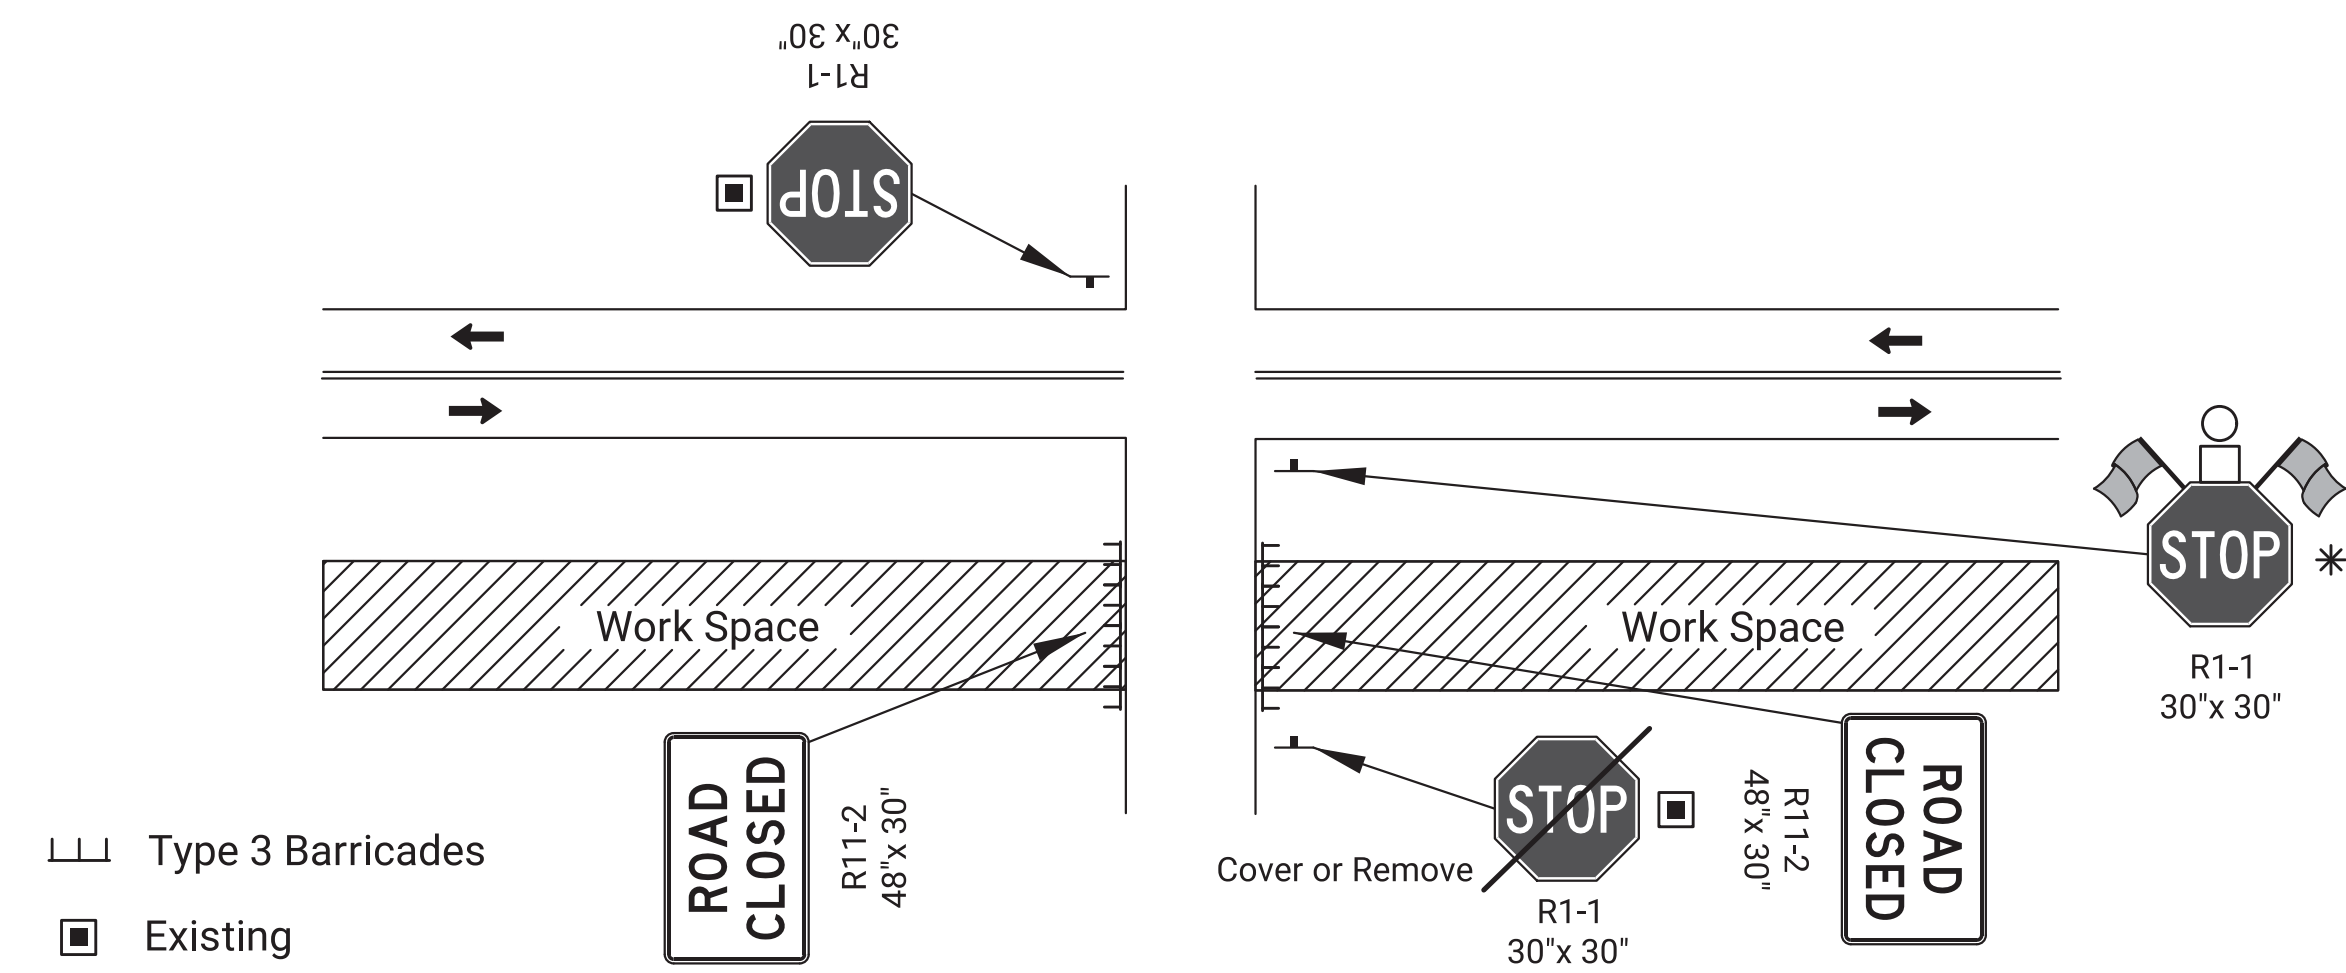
SIDE ROAD OPEN THROUGH WORK AREA ON DIVIDED ROADWAY
